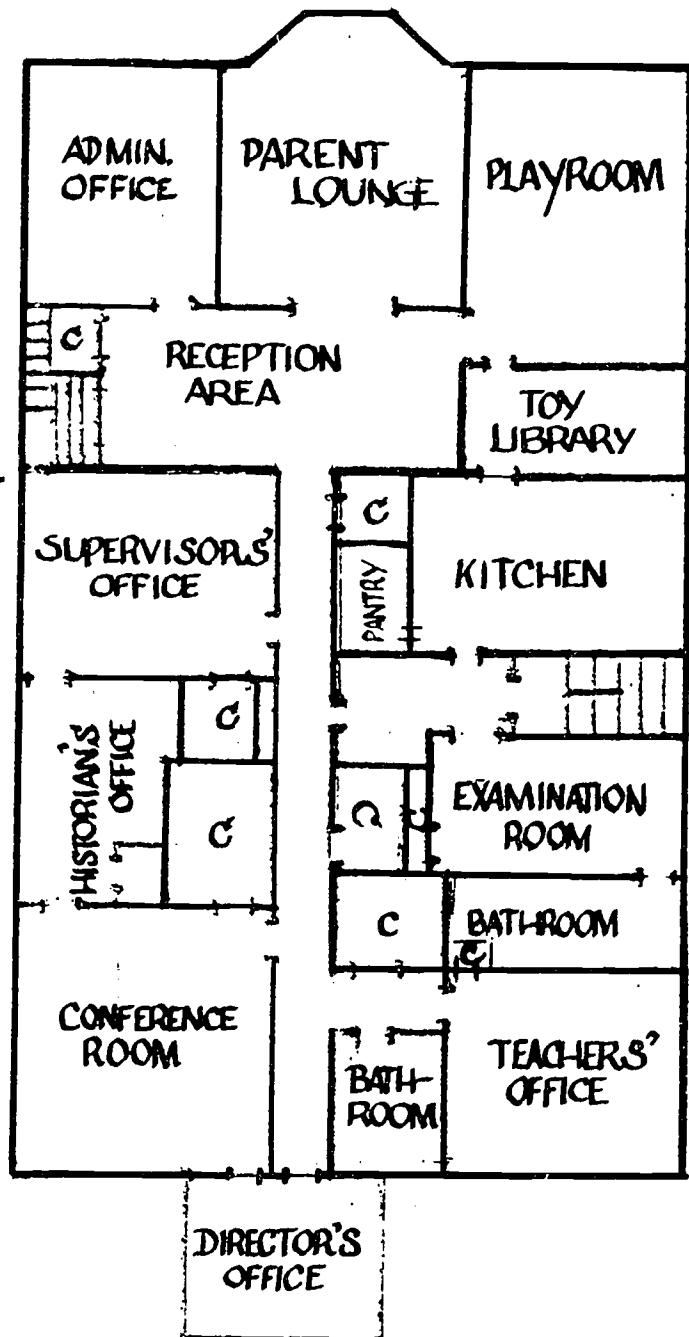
Floor plan of the BEEP Center showing the layout of the rooms and their main use. Scale: $\frac{1}{4}$ inch = 1 foot.
